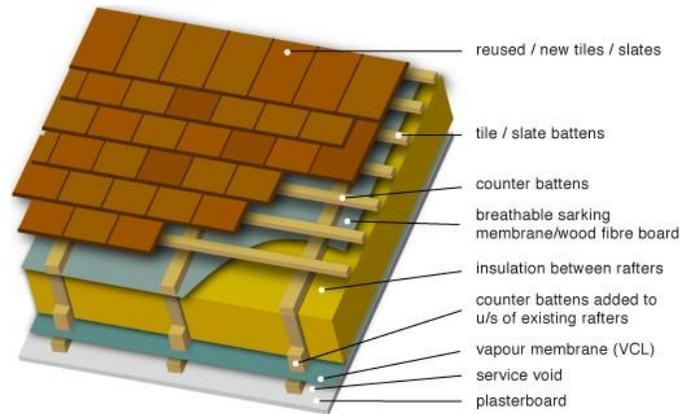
Roof insulation installed between and beneath the rafters (Source: www.greenspec. co.uk building design), (Chinazzo, 2013-14)
